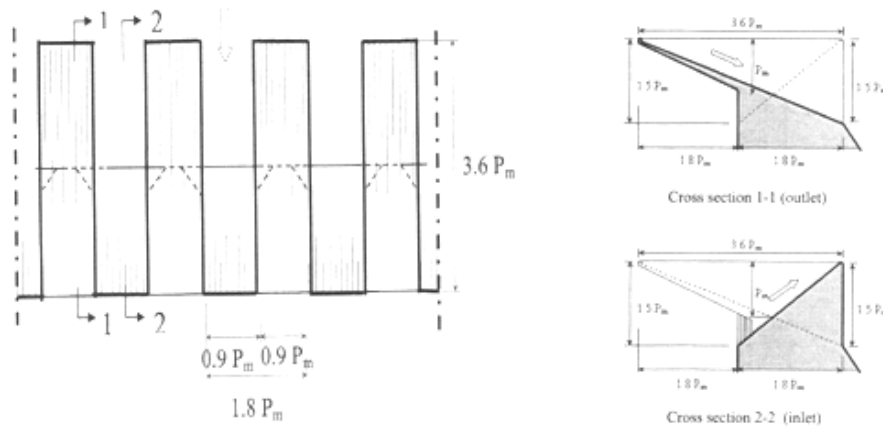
Proposed reference design pour PKW model B – plan view (left) and cross sections (right).
